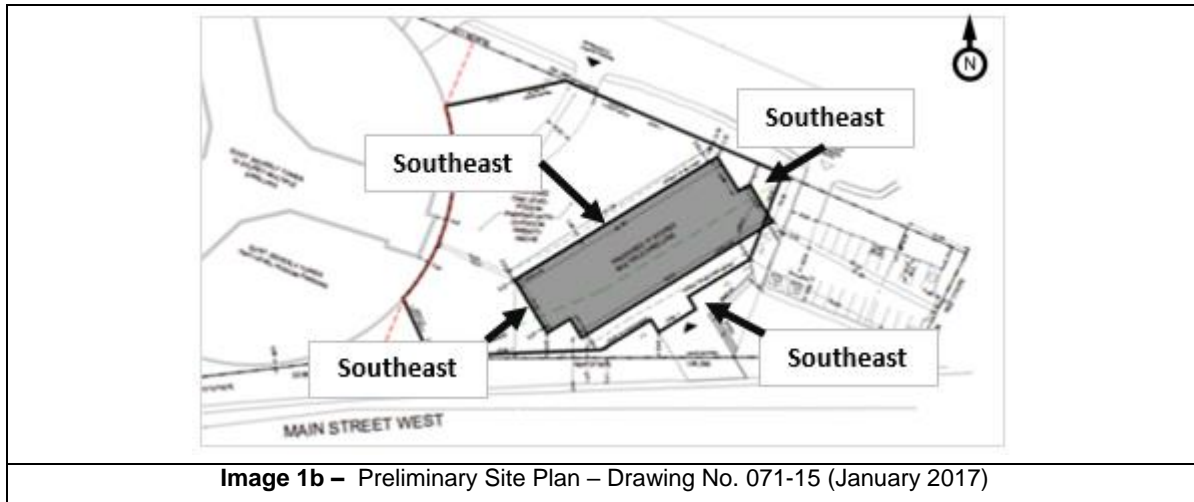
Preliminary Site Plan – Drawing No. 071-15 (January 2017)
